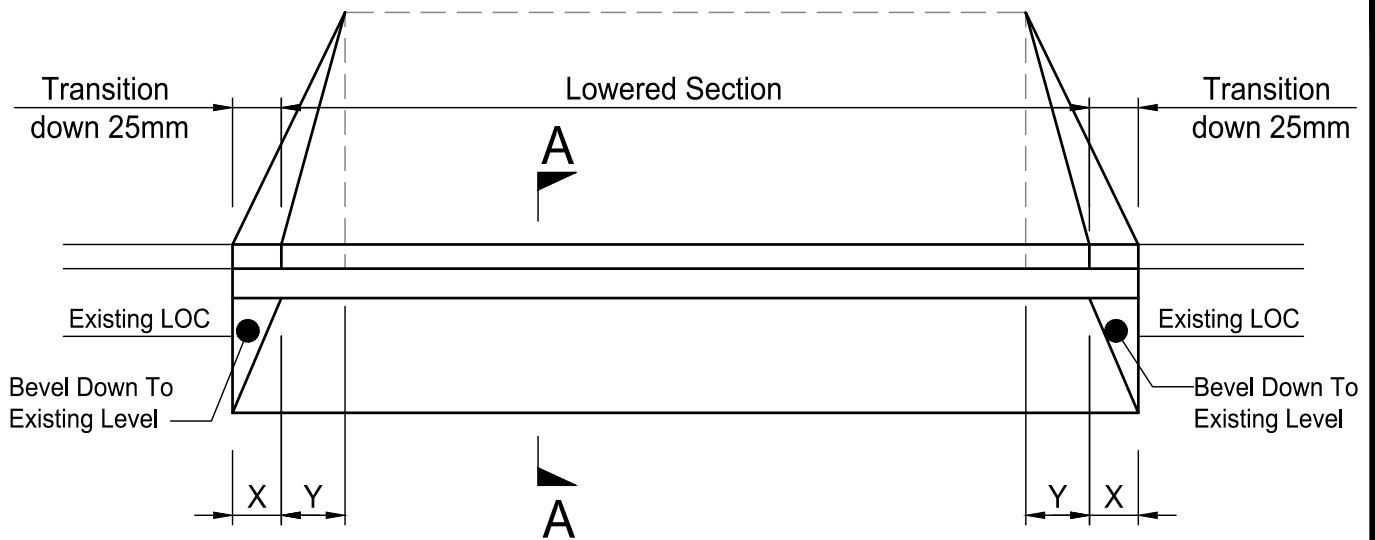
PLATE VEHICLE CROSSING - CHANNEL DETAIL
